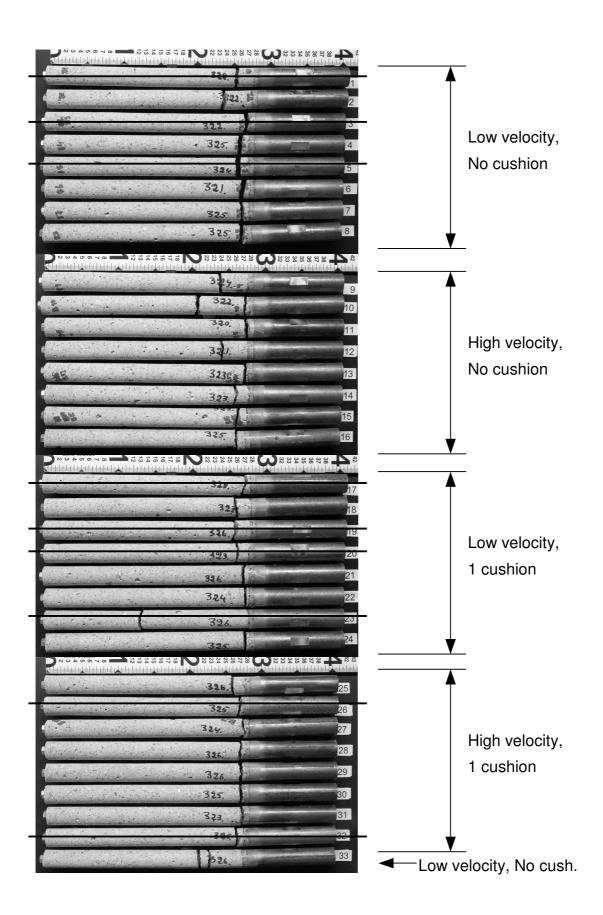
Specimens after testing (number on specimen is weight of specimen)
